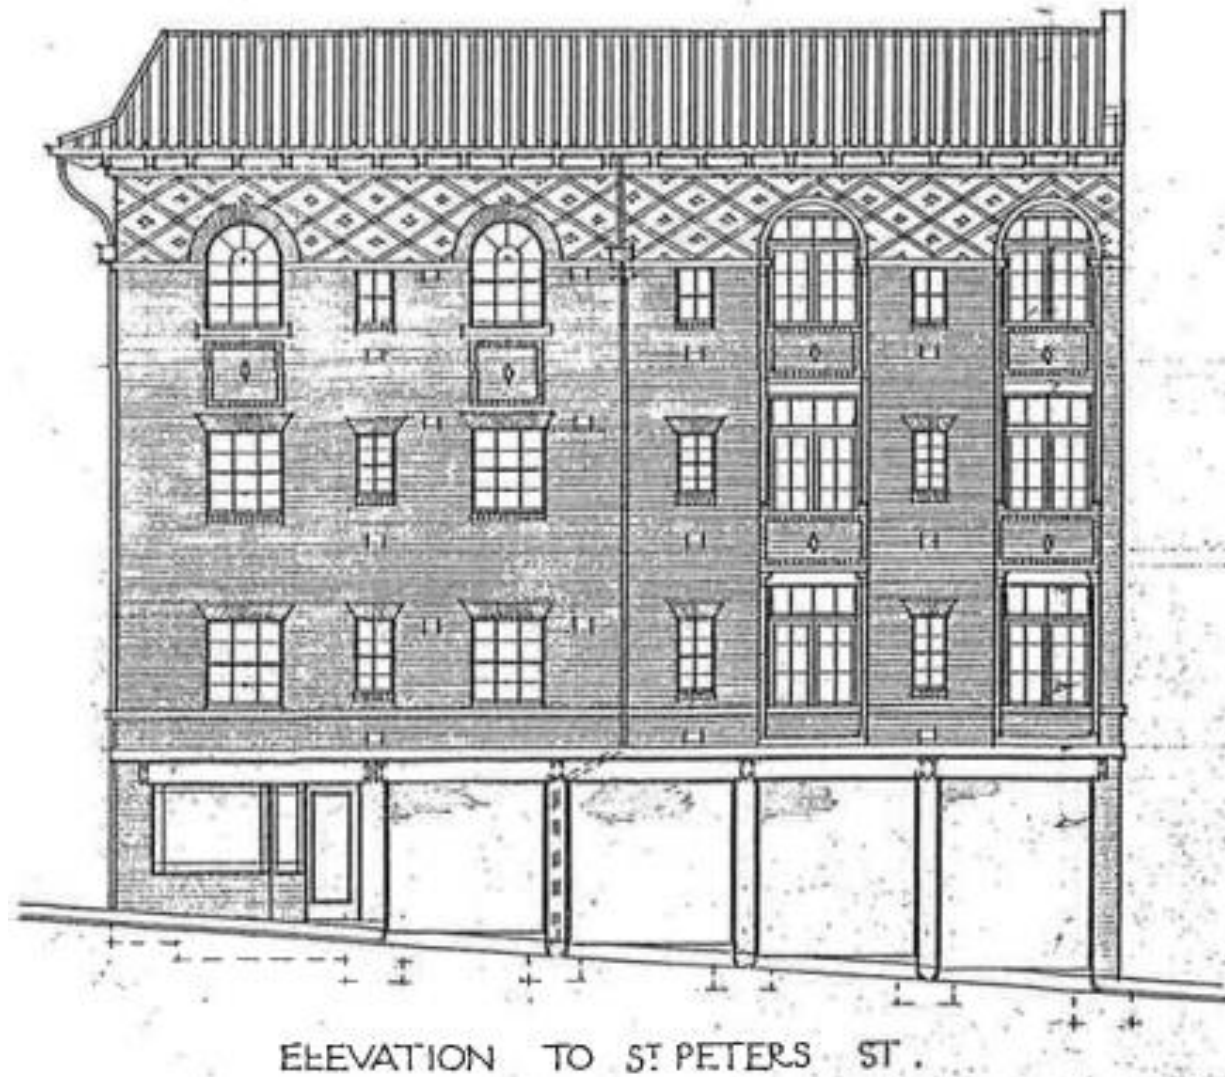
Proposed original elevation to St Peters Street, 1926.
